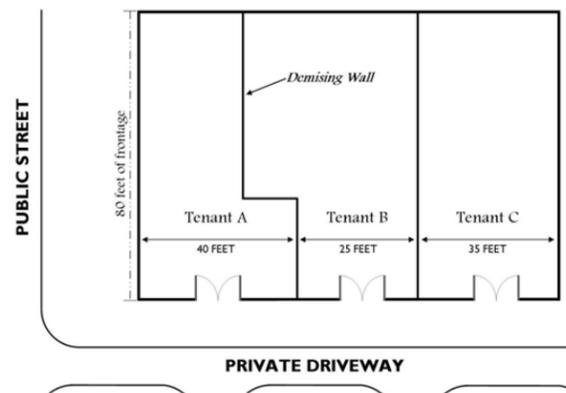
Horizontal Multiple Tenant Building not oriented towards street frontage.
